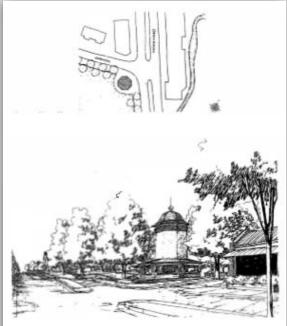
39. Downtown 2016 Plan - Proposal of Pavillion at Booth Park.
